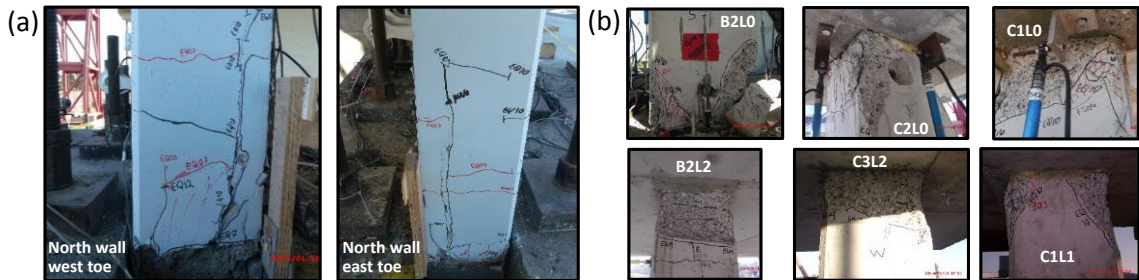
Precast components damages: (a) North wall; (b) Precast columns.
